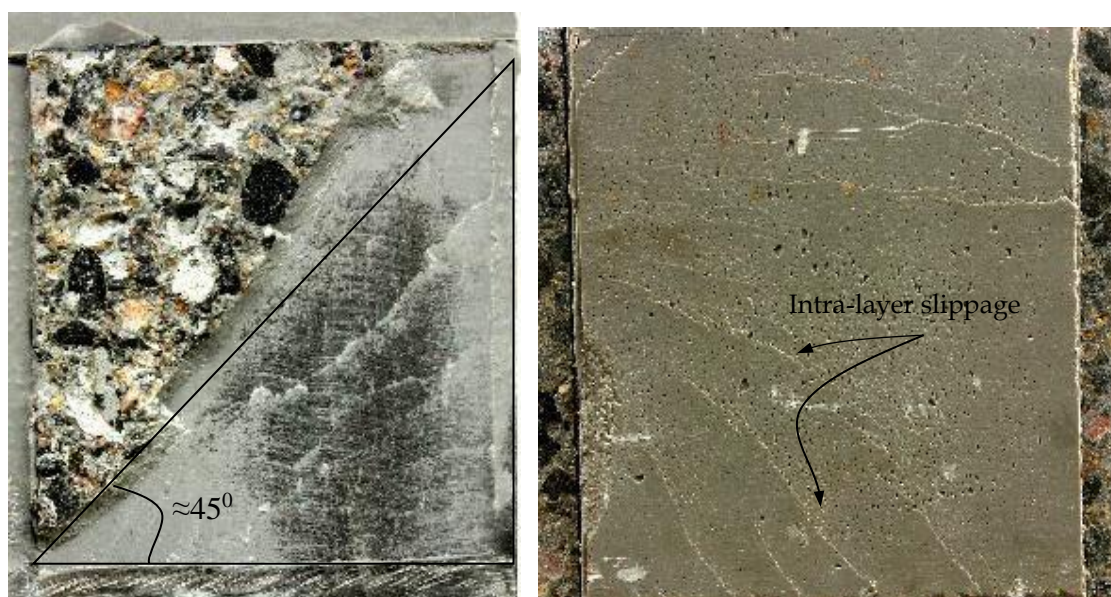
Mode of failure for three mm thick adhesive layer: (a) Mixed mode failure of concrete-epoxy-steel interface and (b) Adhesive bond failure
